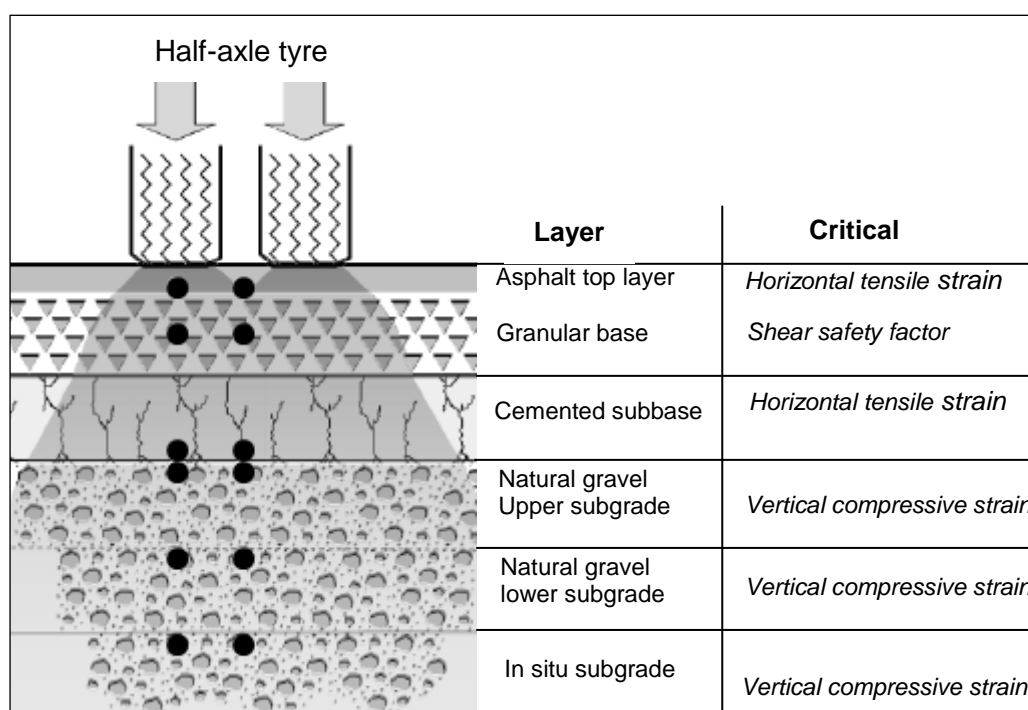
Analysis Positions for Critical Parameters in a Flexible Pavement Structure (Adapted from SAPEM, 2013).
